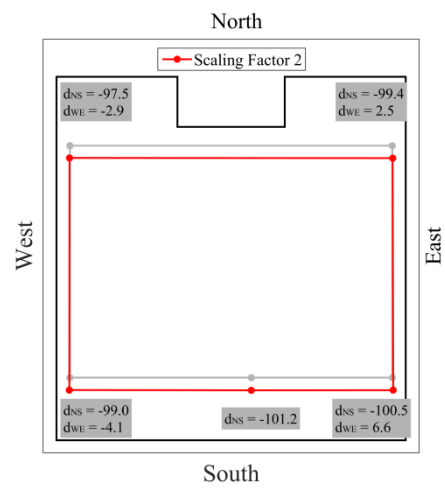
Test #25 EQ-NPR IS 133% - Second-floor diaphragm deformed shape at maximum average second-floor displacement.
